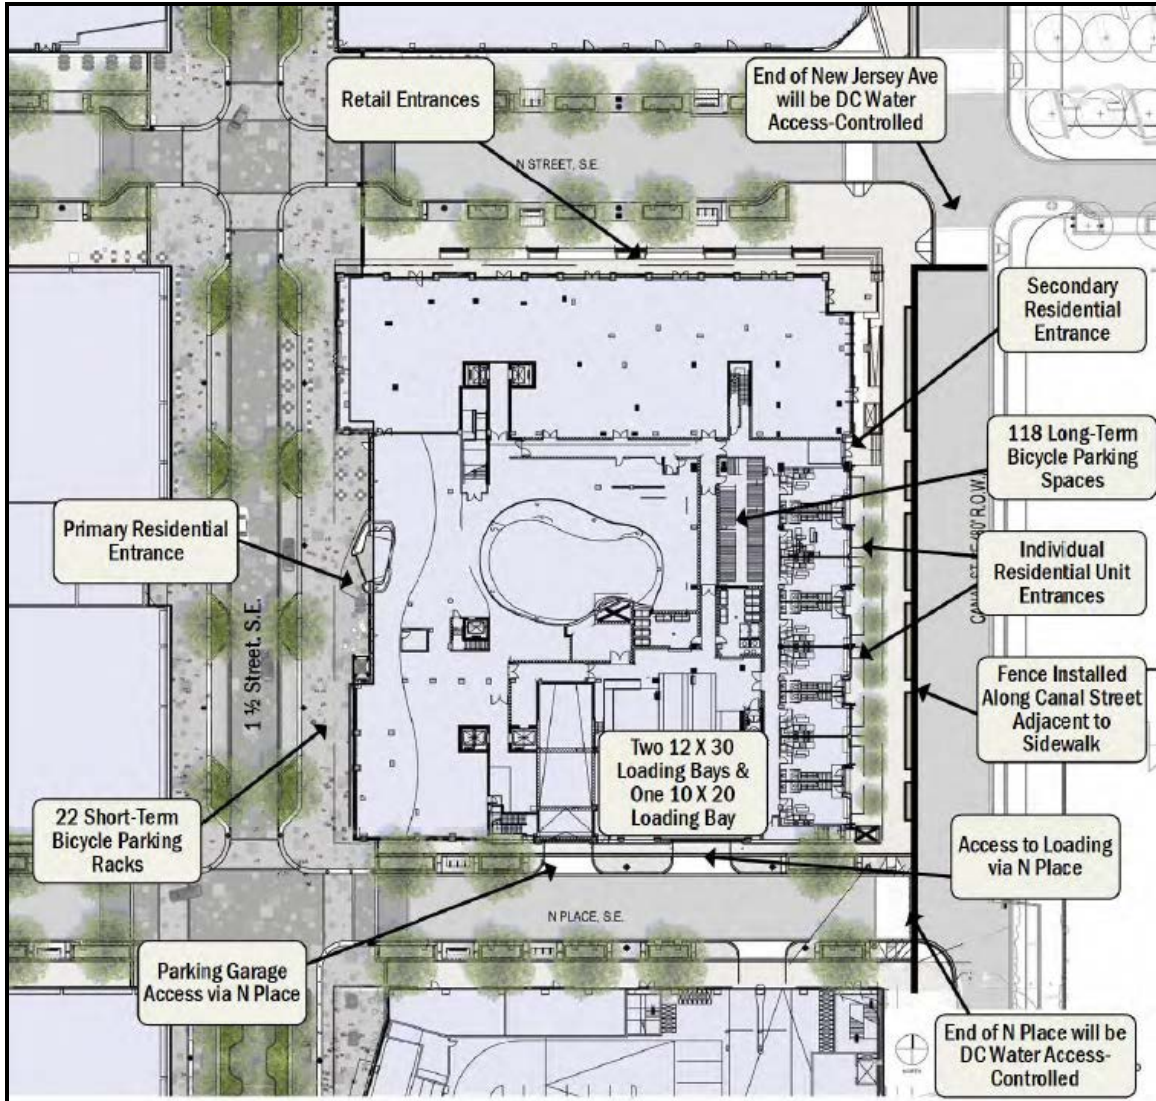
Site Plan (Source: CTR, Gorove/Slade, Figure 7, 11/26/18)
